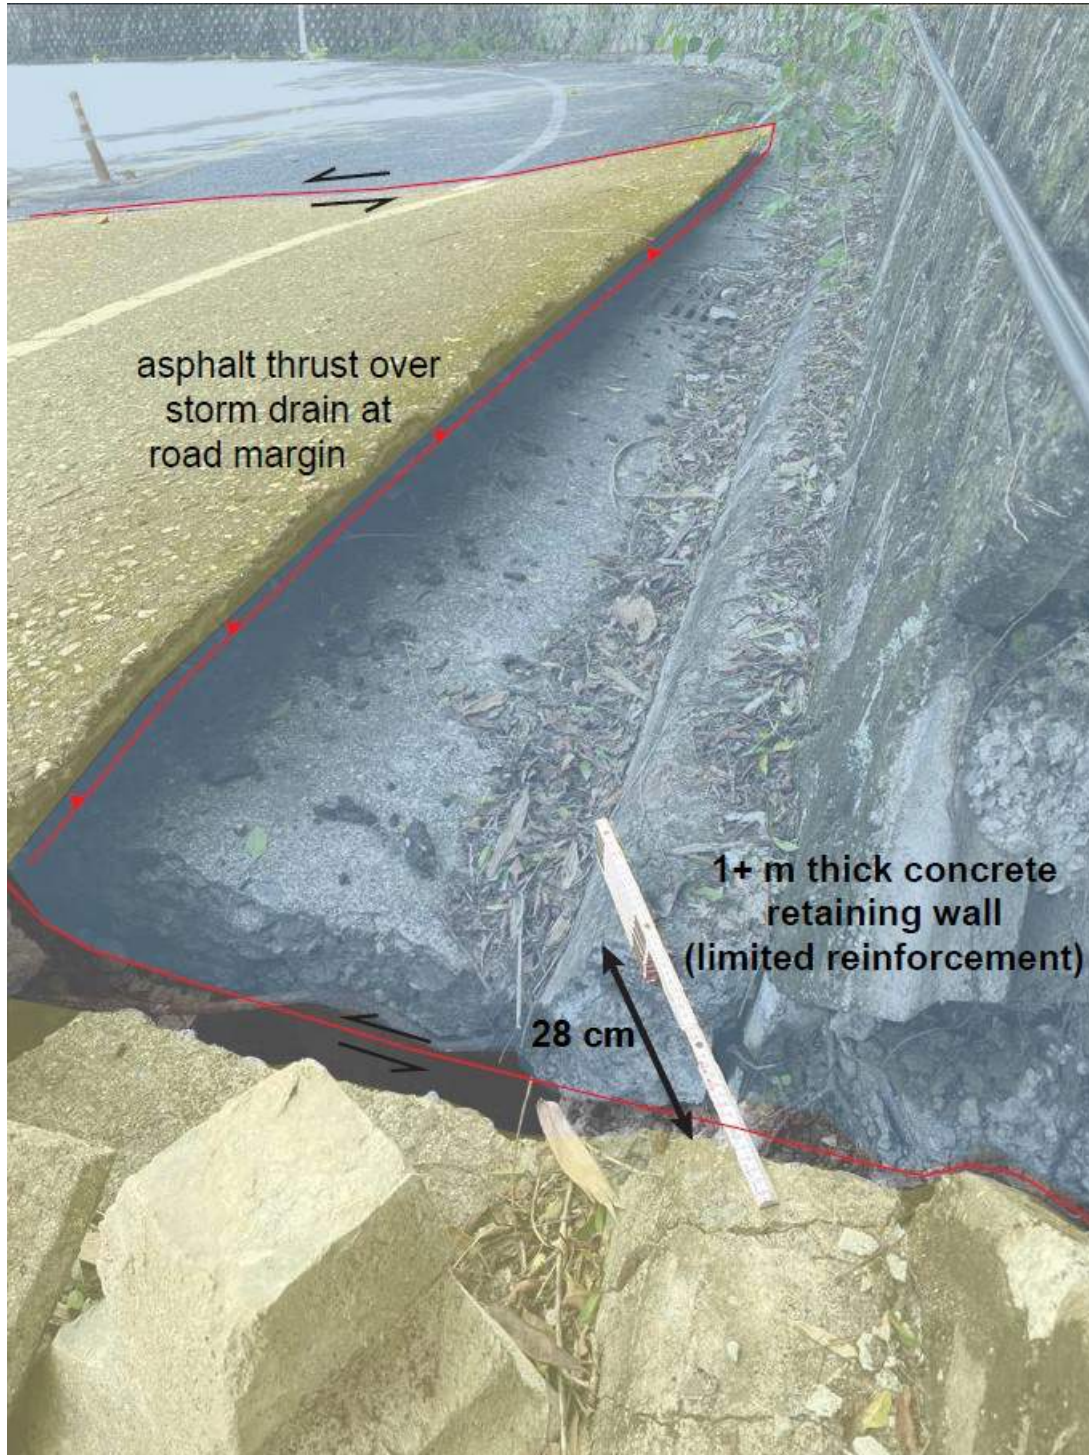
Annotated photo showing view of buckled pavement on bridge approach. Net horizontal displacement of the 1-m-thick concrete retaining wall (sparse reinforcement) was ~28 cm, Lat: 23° 15' 46.403640", Lon: 121° 18' 9.362160"
